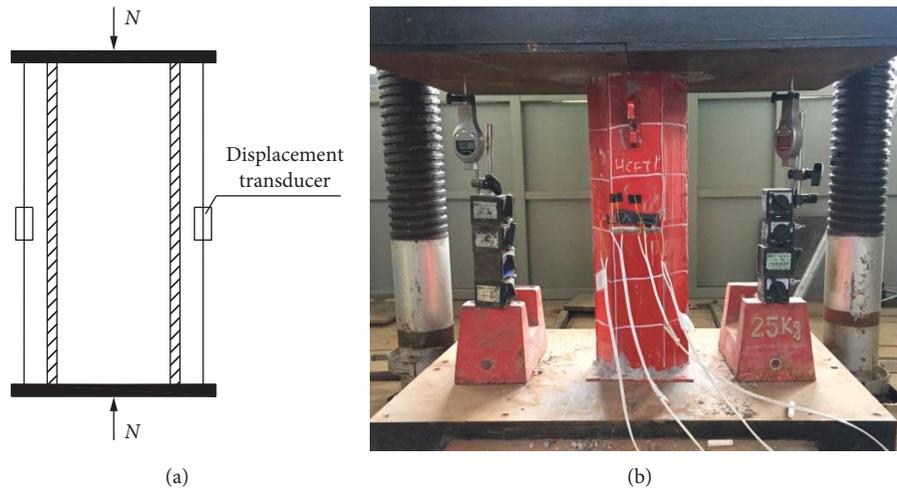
Sketch for testing the apparatus of CFST stub column. (a) Test setup. (b) Loading device.
